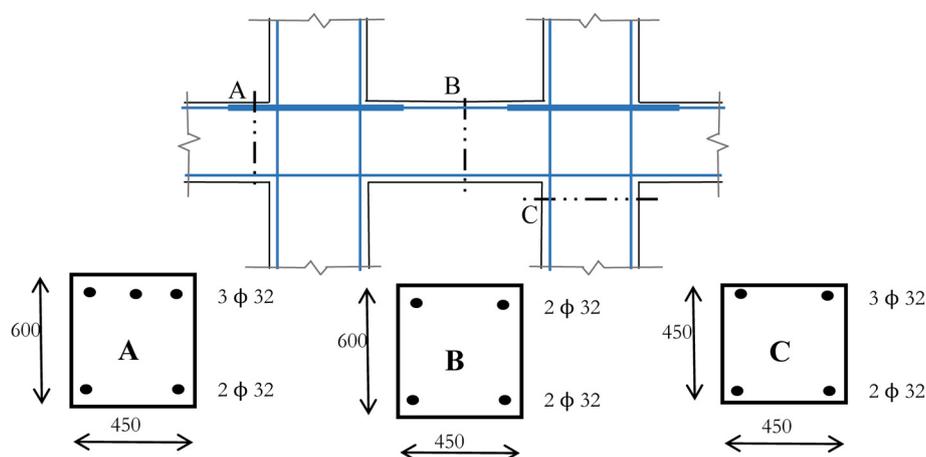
Reinforcement details in elevation and cross section views in mm [11]
